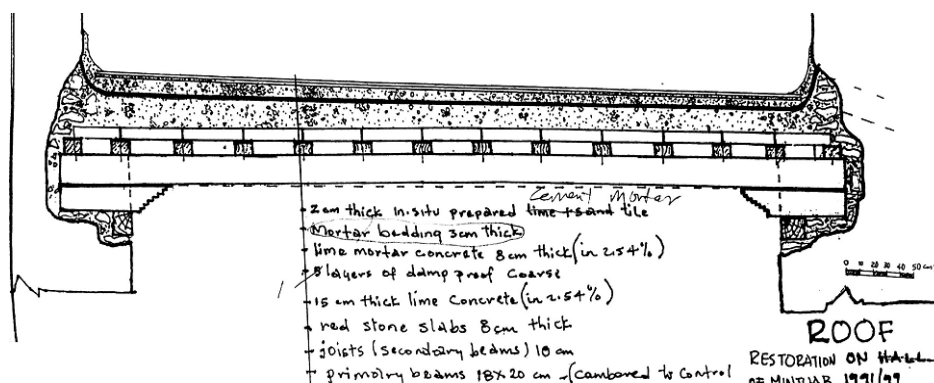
Cross section of the traditional roof slab (Getahun 2000)
